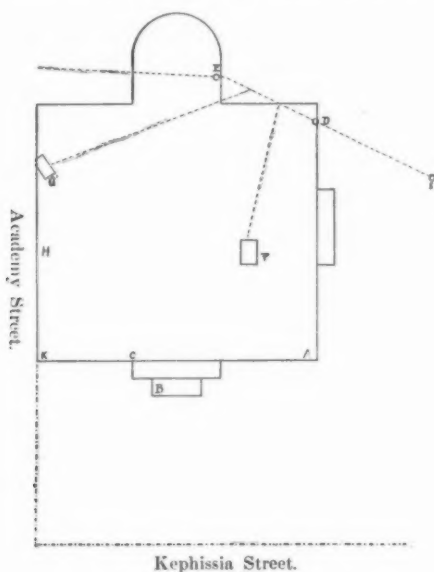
PLAN OF MR. MERLIN'S HOUSE.
